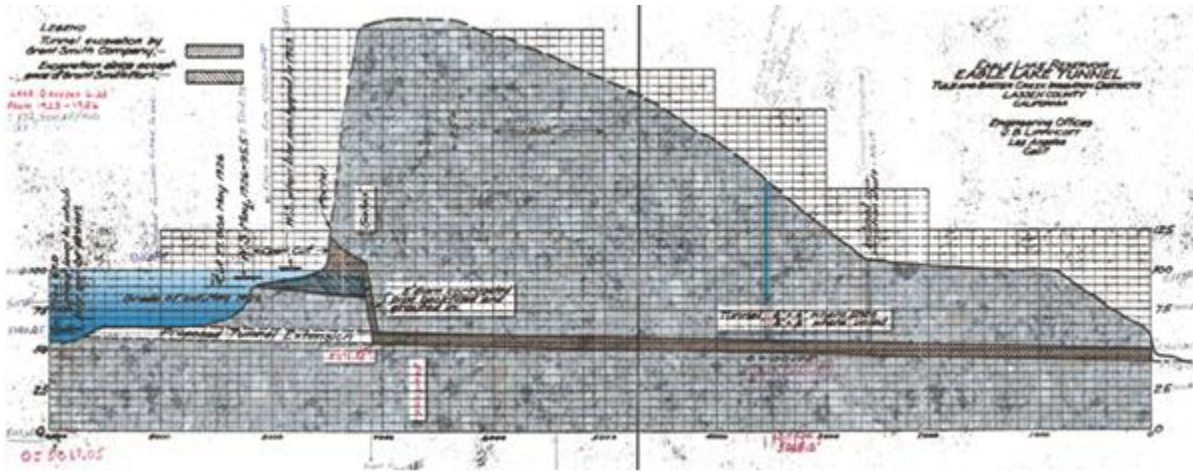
Detailed plans of the Bly Tunnel after completion. Shown is also the improvised cut that was proposed because of lake level drop and the 2600 foot mark access tunnel where tailings of the tunnel were taken out (from Bateson, 2016).
